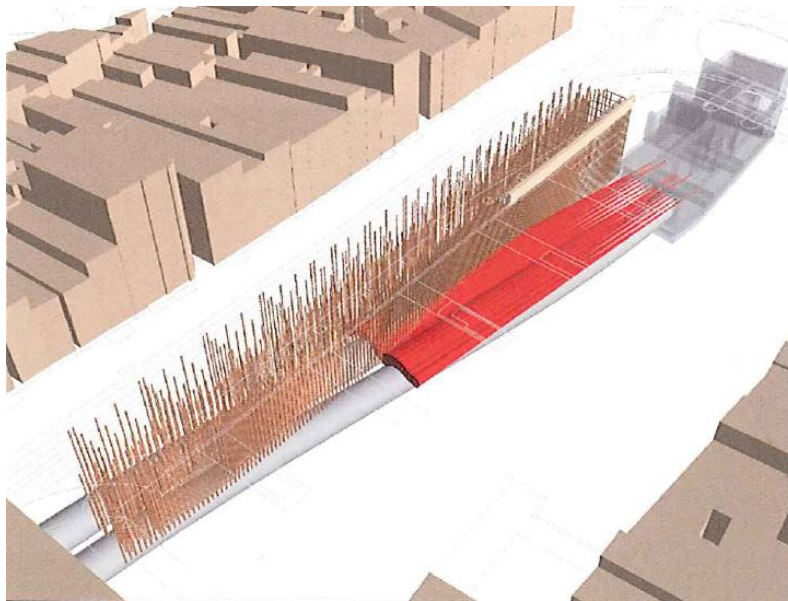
Frozen canopy above the tunnel tubes at the Damrak
